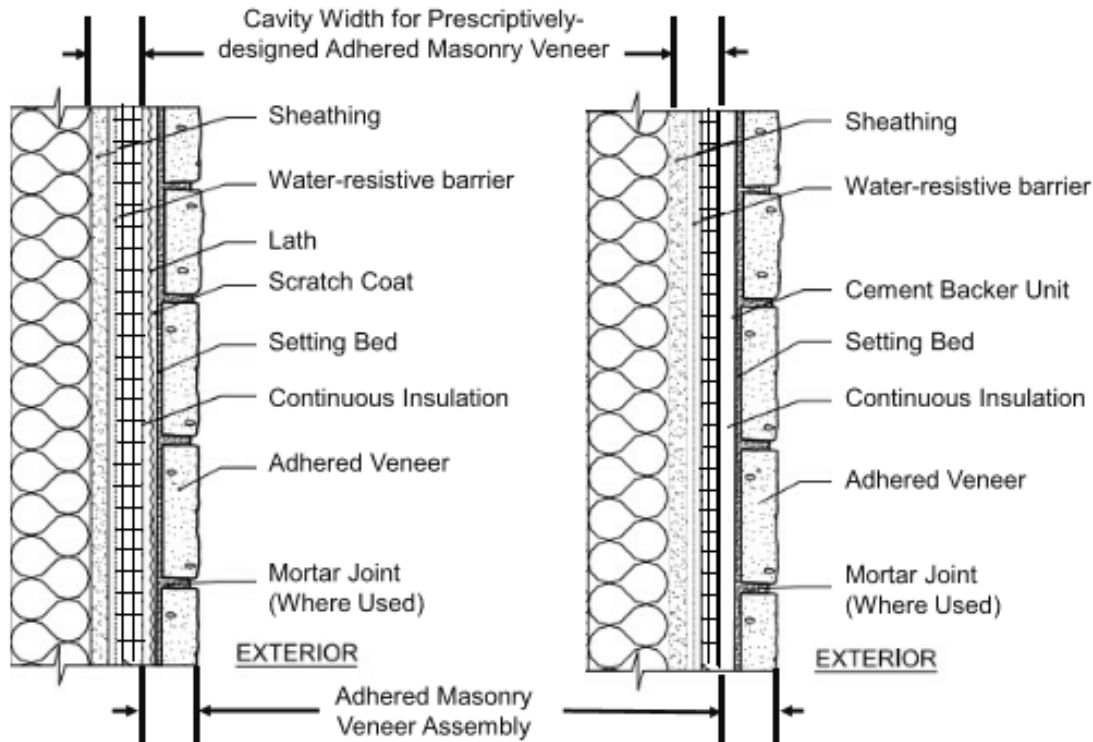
Cross-section of typical adhered masonry veneer supported by light frame
